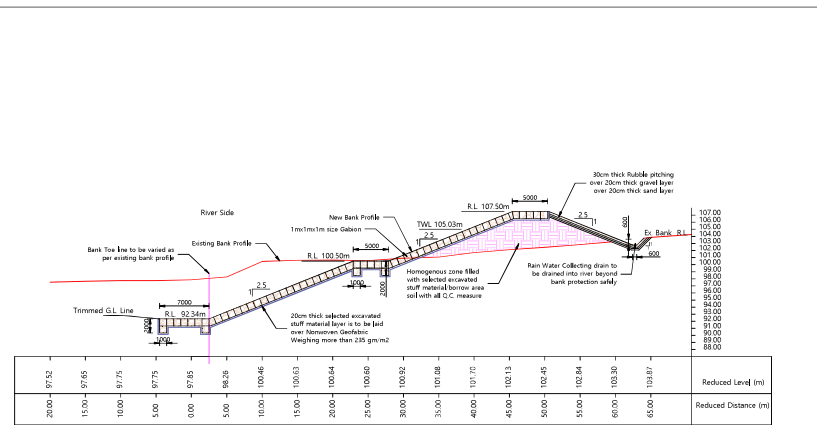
(A) TYPICAL CROSS SECTION OF HIRAPURA BARRAGE GUIDE BANK - D/S RHS @ CH. 120 m
